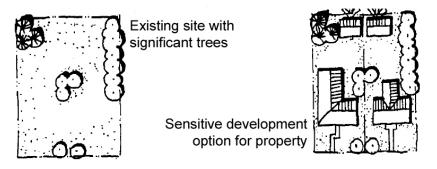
D.3.a Site Planning for Tree Preservation
